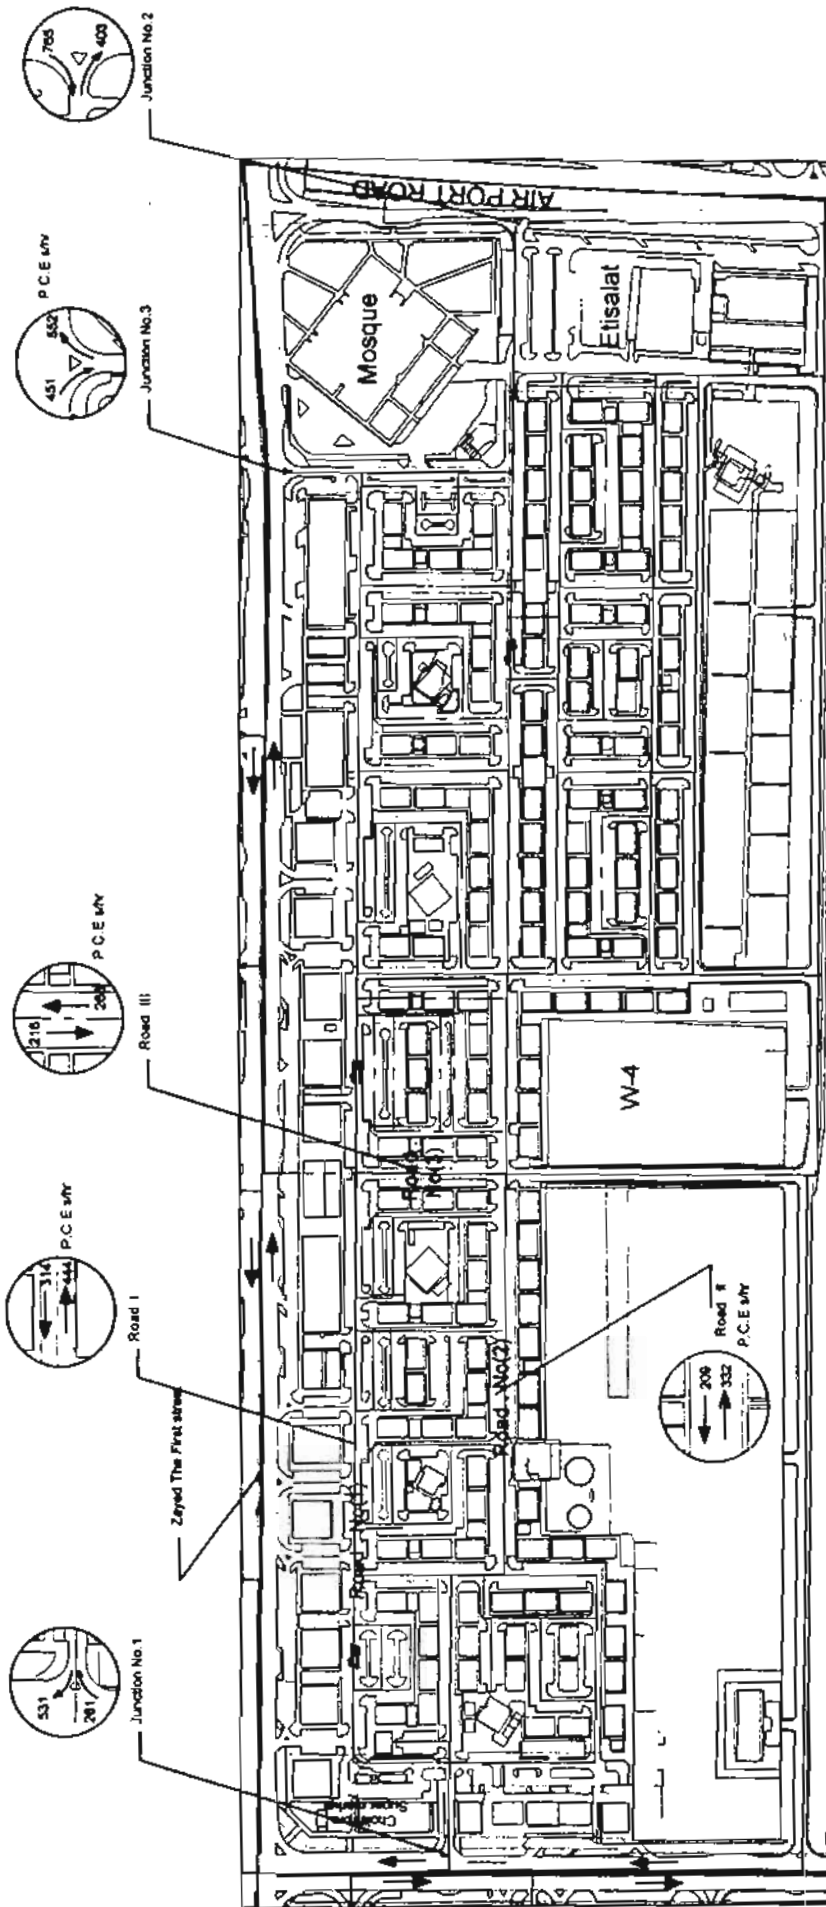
Existing Geometrical Plan Of Sector W-4 Showing the Main Sector Road and Exit / Entry Junctions (before situation)
